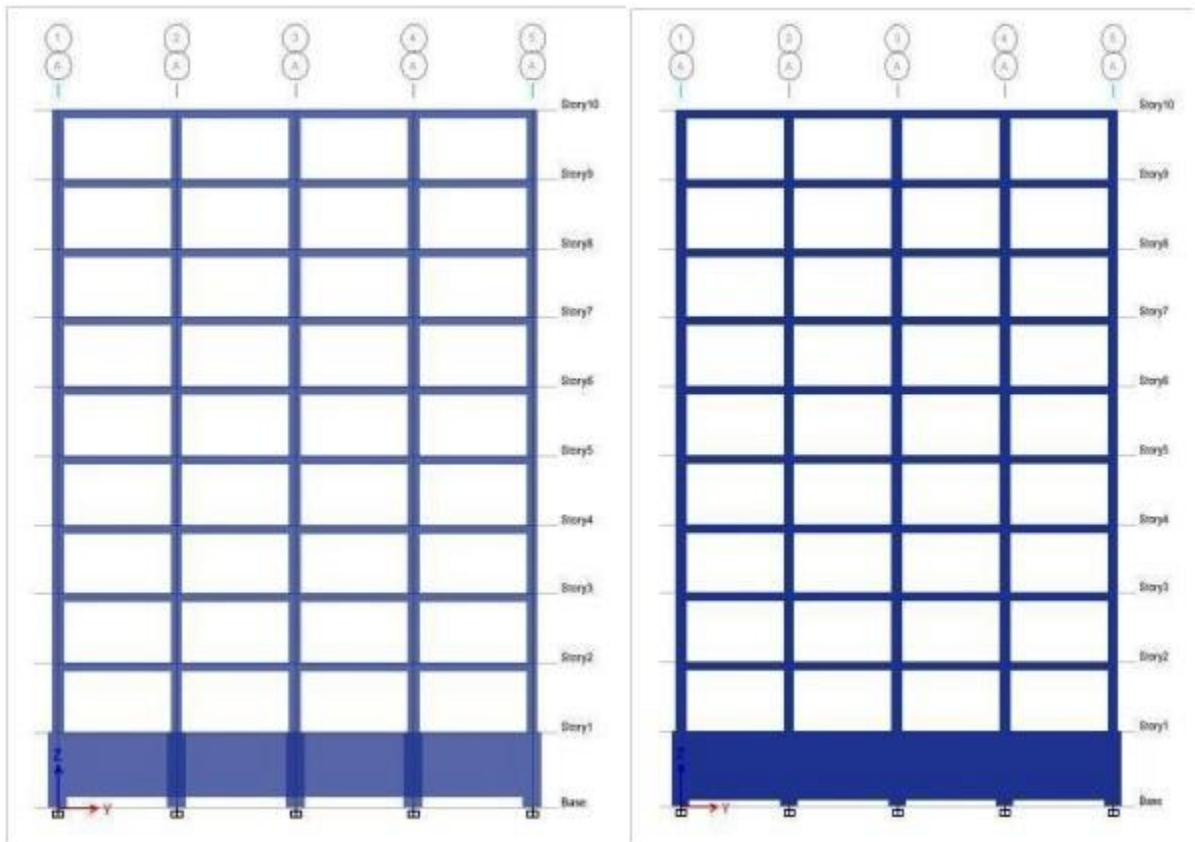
5: Elevation of building with 3m and 3.2m deep beam (Belgaonkar. S et al (2016))
